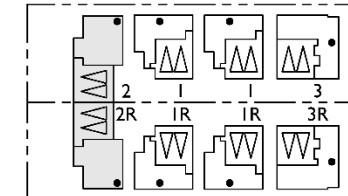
Cluster Product – Typical Elevations (Plan 3)
